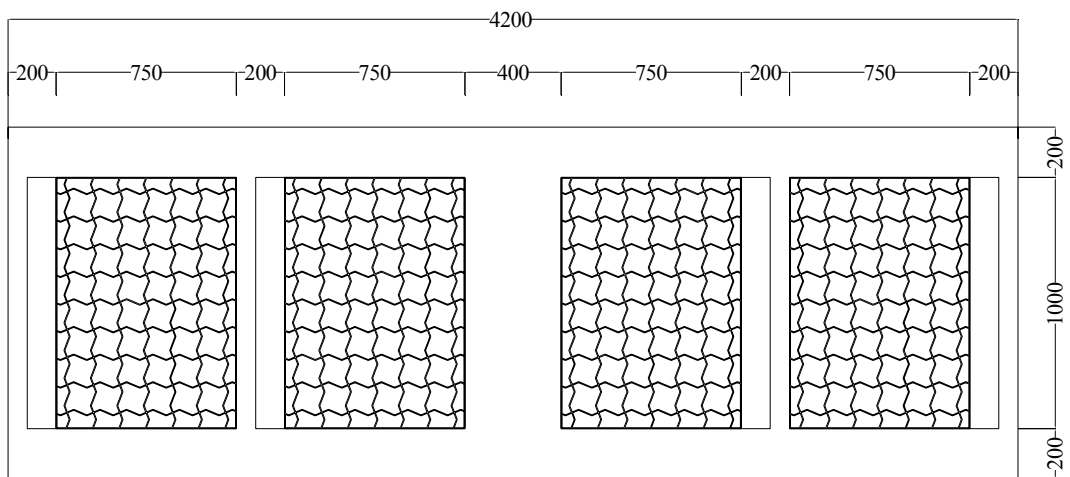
Specimen with Infill Wall Made of S-shaped Concrete Blocks
